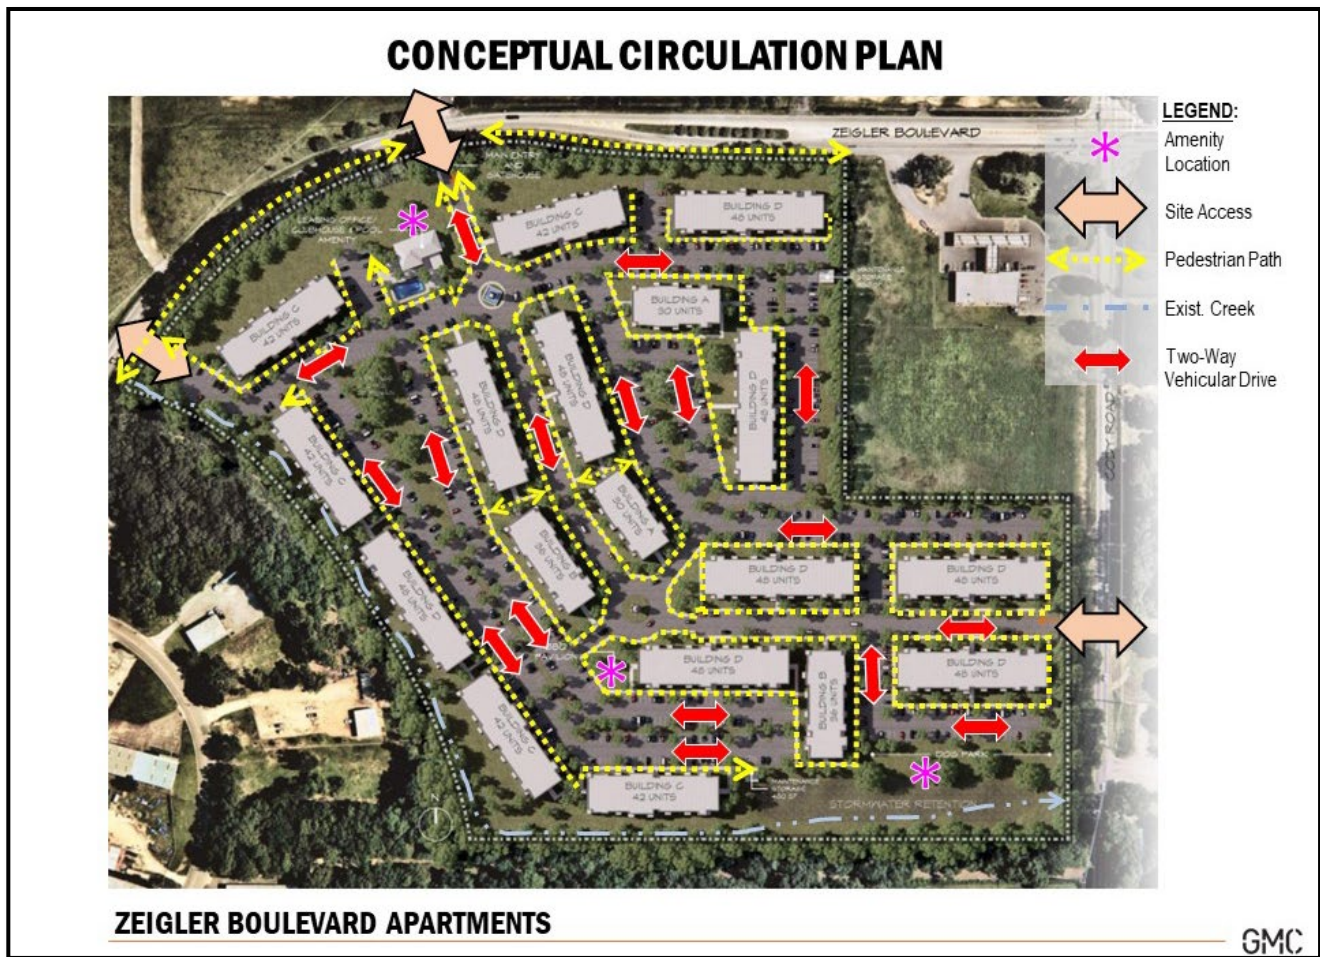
General Site Circulation Plan. The site will be accessed from Cody Road and Zeigler Boulevard. Ample surface parking is served by two-way vehicular drives with sidewalks connecting buildings to amenities, parking, and existing roads. Plan prepared by GMC.
